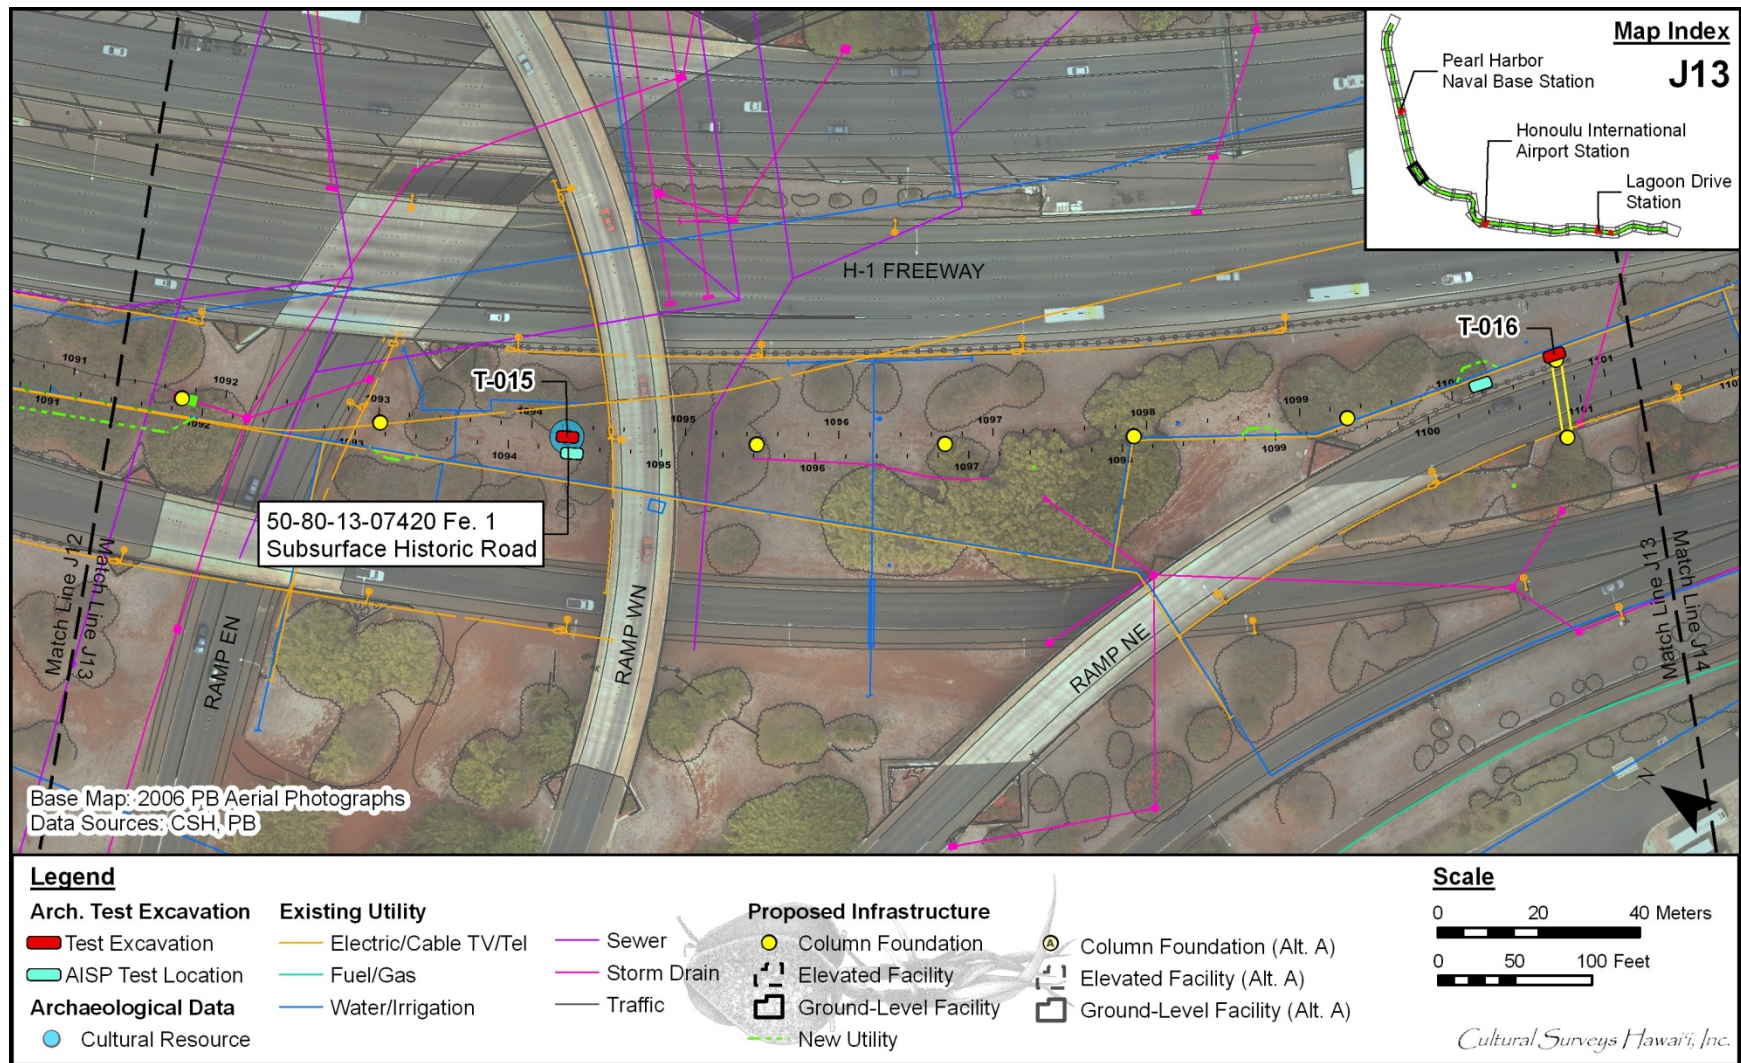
Map Sheet J13, two column foundation test excavations (T-015 and T-016) @ 1083+00 & (mauka) 1089+00
